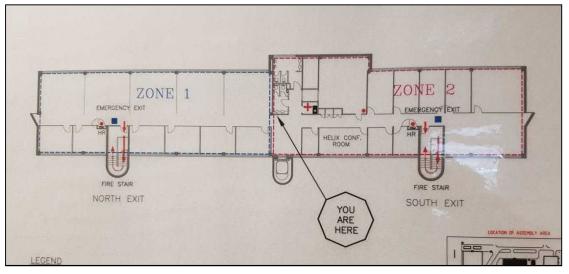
State Office Building interior Fire Exit Plan showing building layout.
